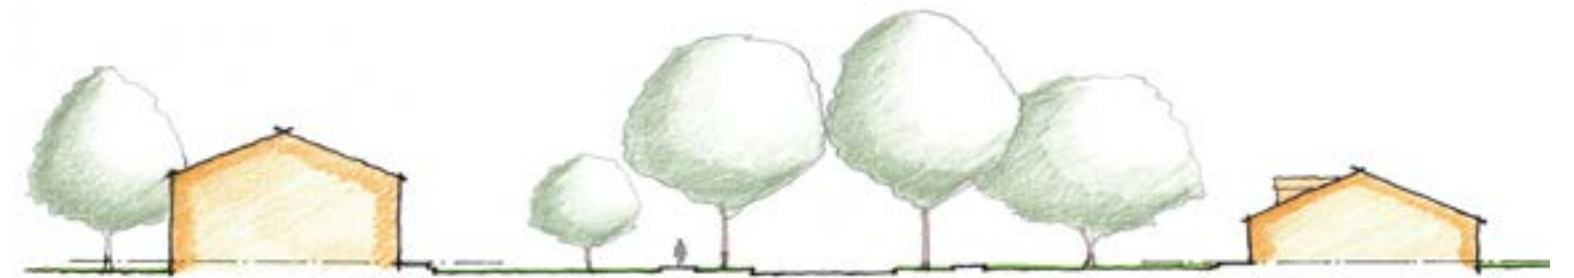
South Merkle Road section south of Powell. Note the shallower setbacks.
